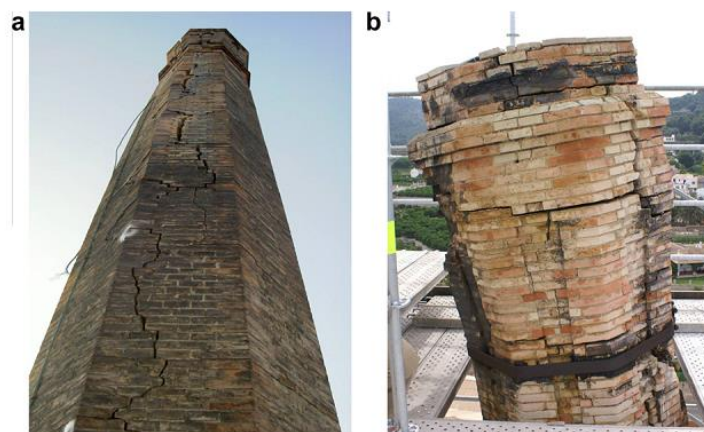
a) Longitudinal cracking caused by thermal gradient; b) Damaged crown
